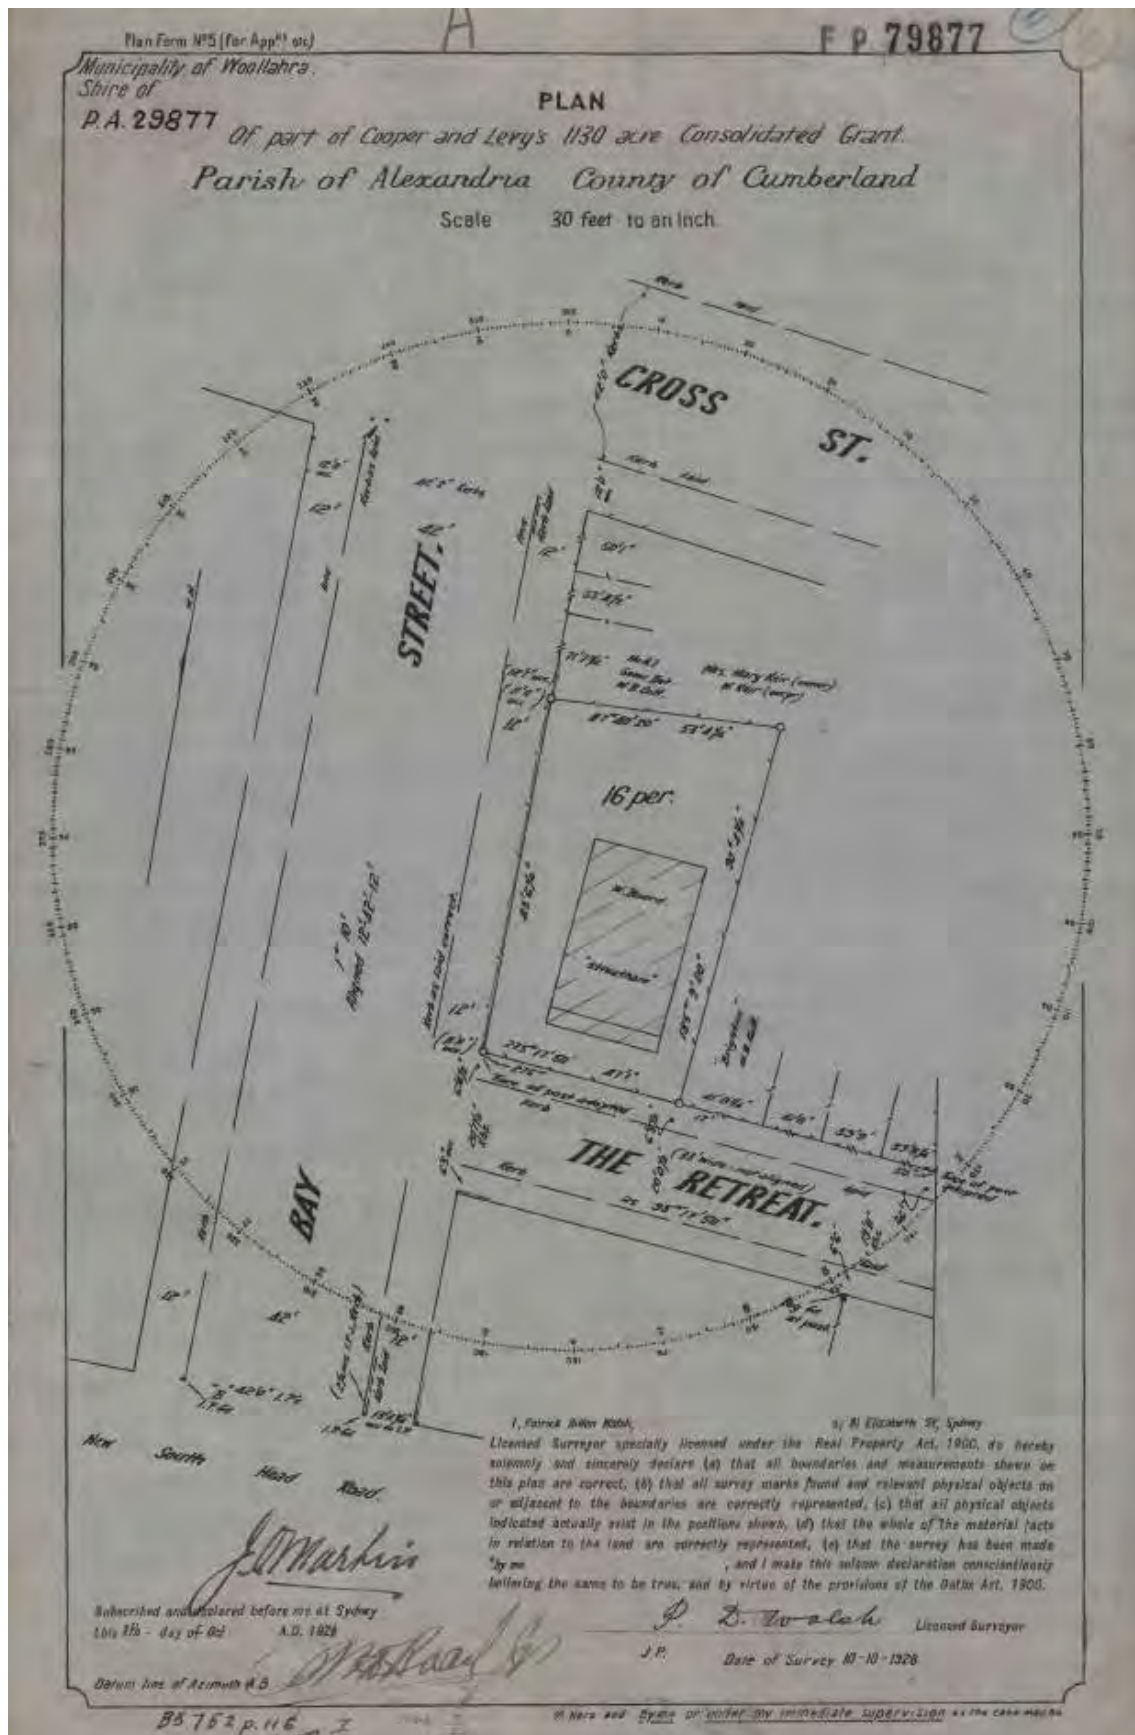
| Survey plan by Patrick Dillon Walsh in 1928, showing the site with the weatherboard cottage prior to the construction of the flat building. (Source: NSW Land Registry Services)
